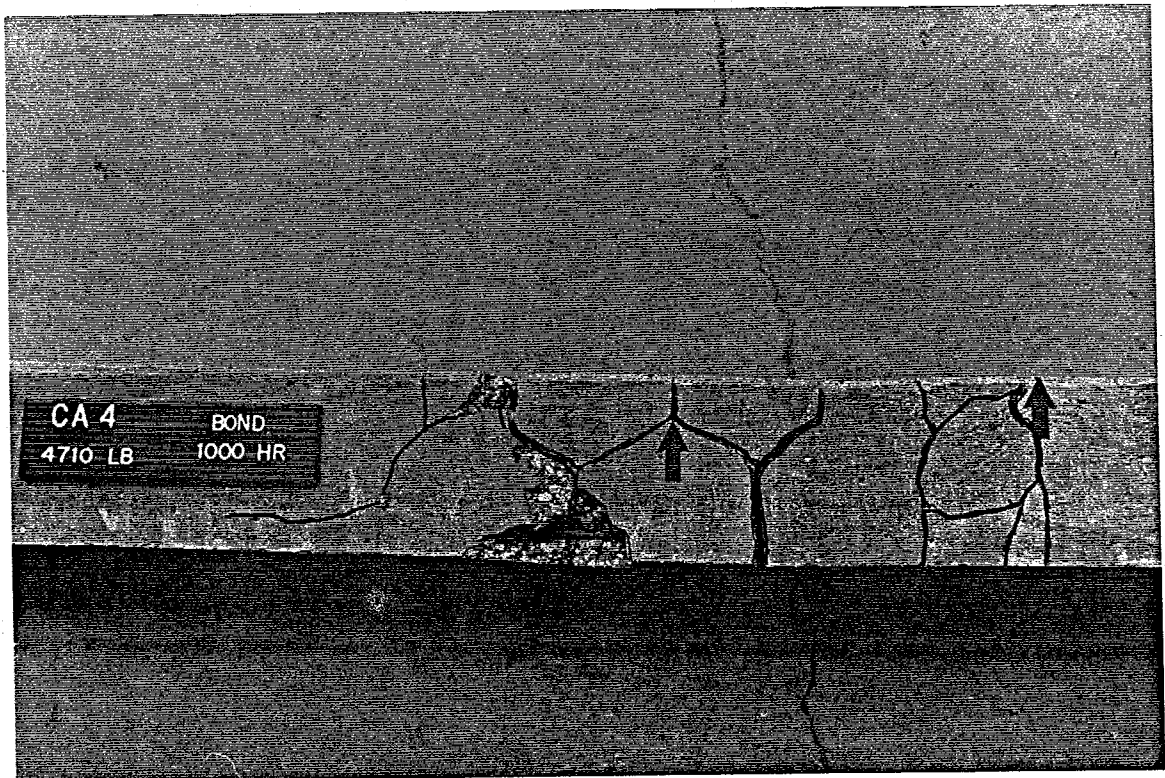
Crack Pattern for Beam CA 4 - Tested After 1,000 Hours
